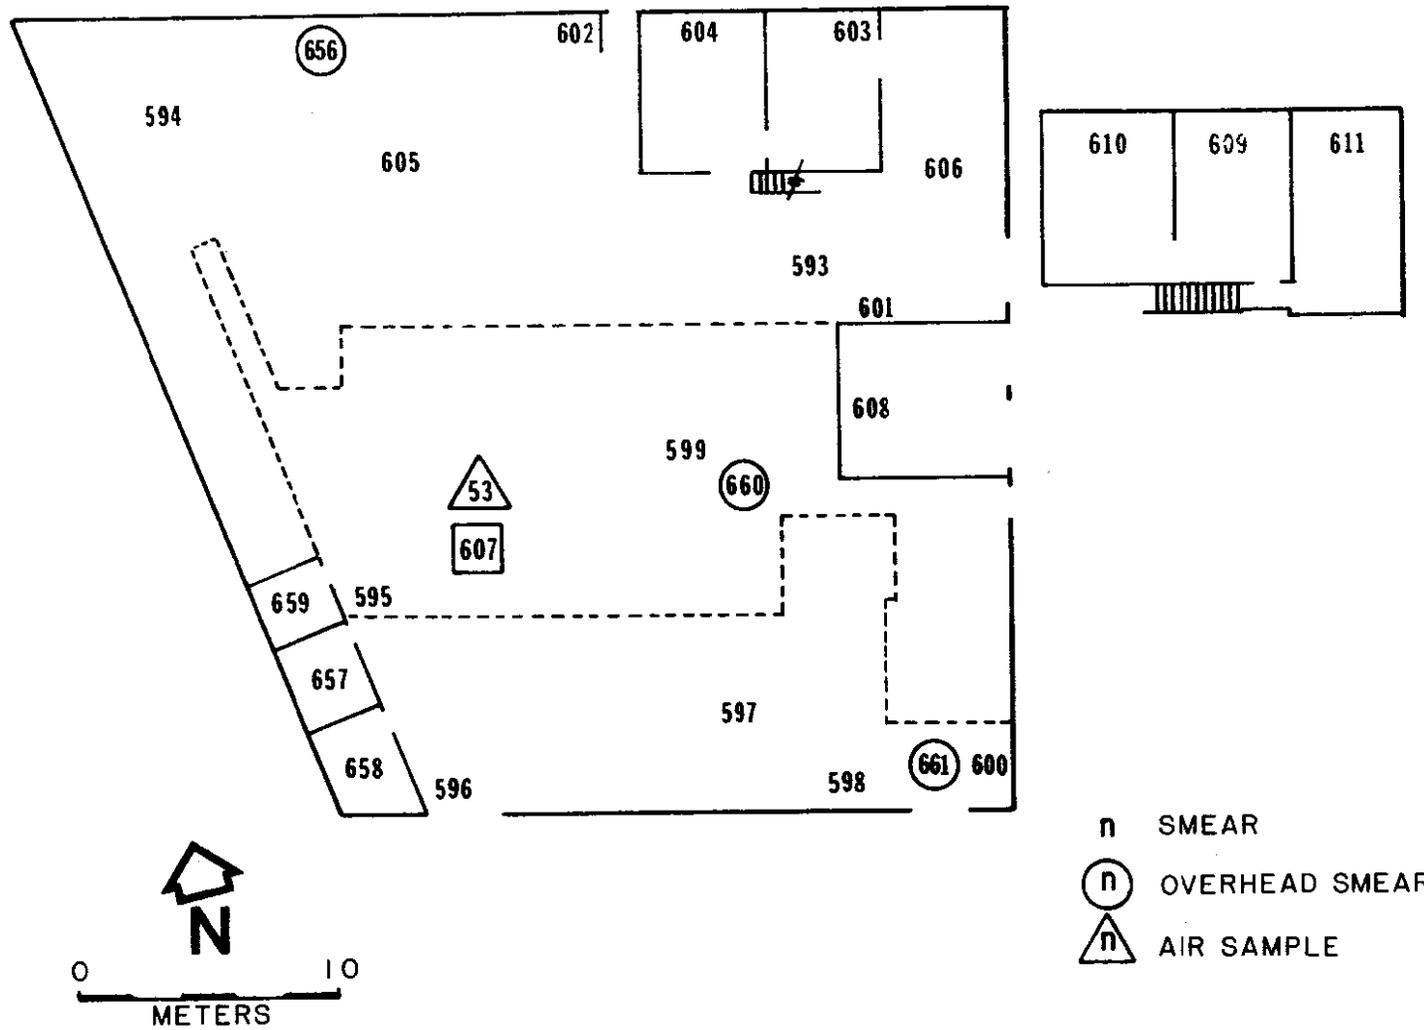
Building L-1 Ground Floor and 2nd Floor Survey Locations.
